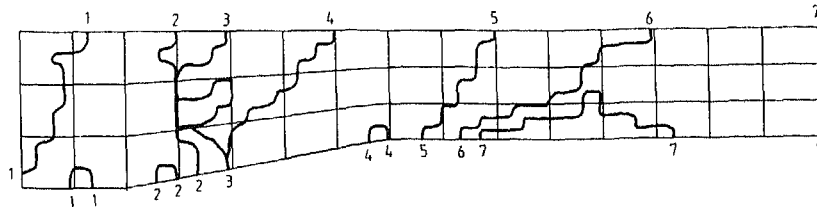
Propagation of Concrete Cracking Wave Front
